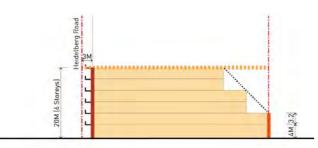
Testing of 6 storey developments with varied street wall heights and upper level street setbacks.
